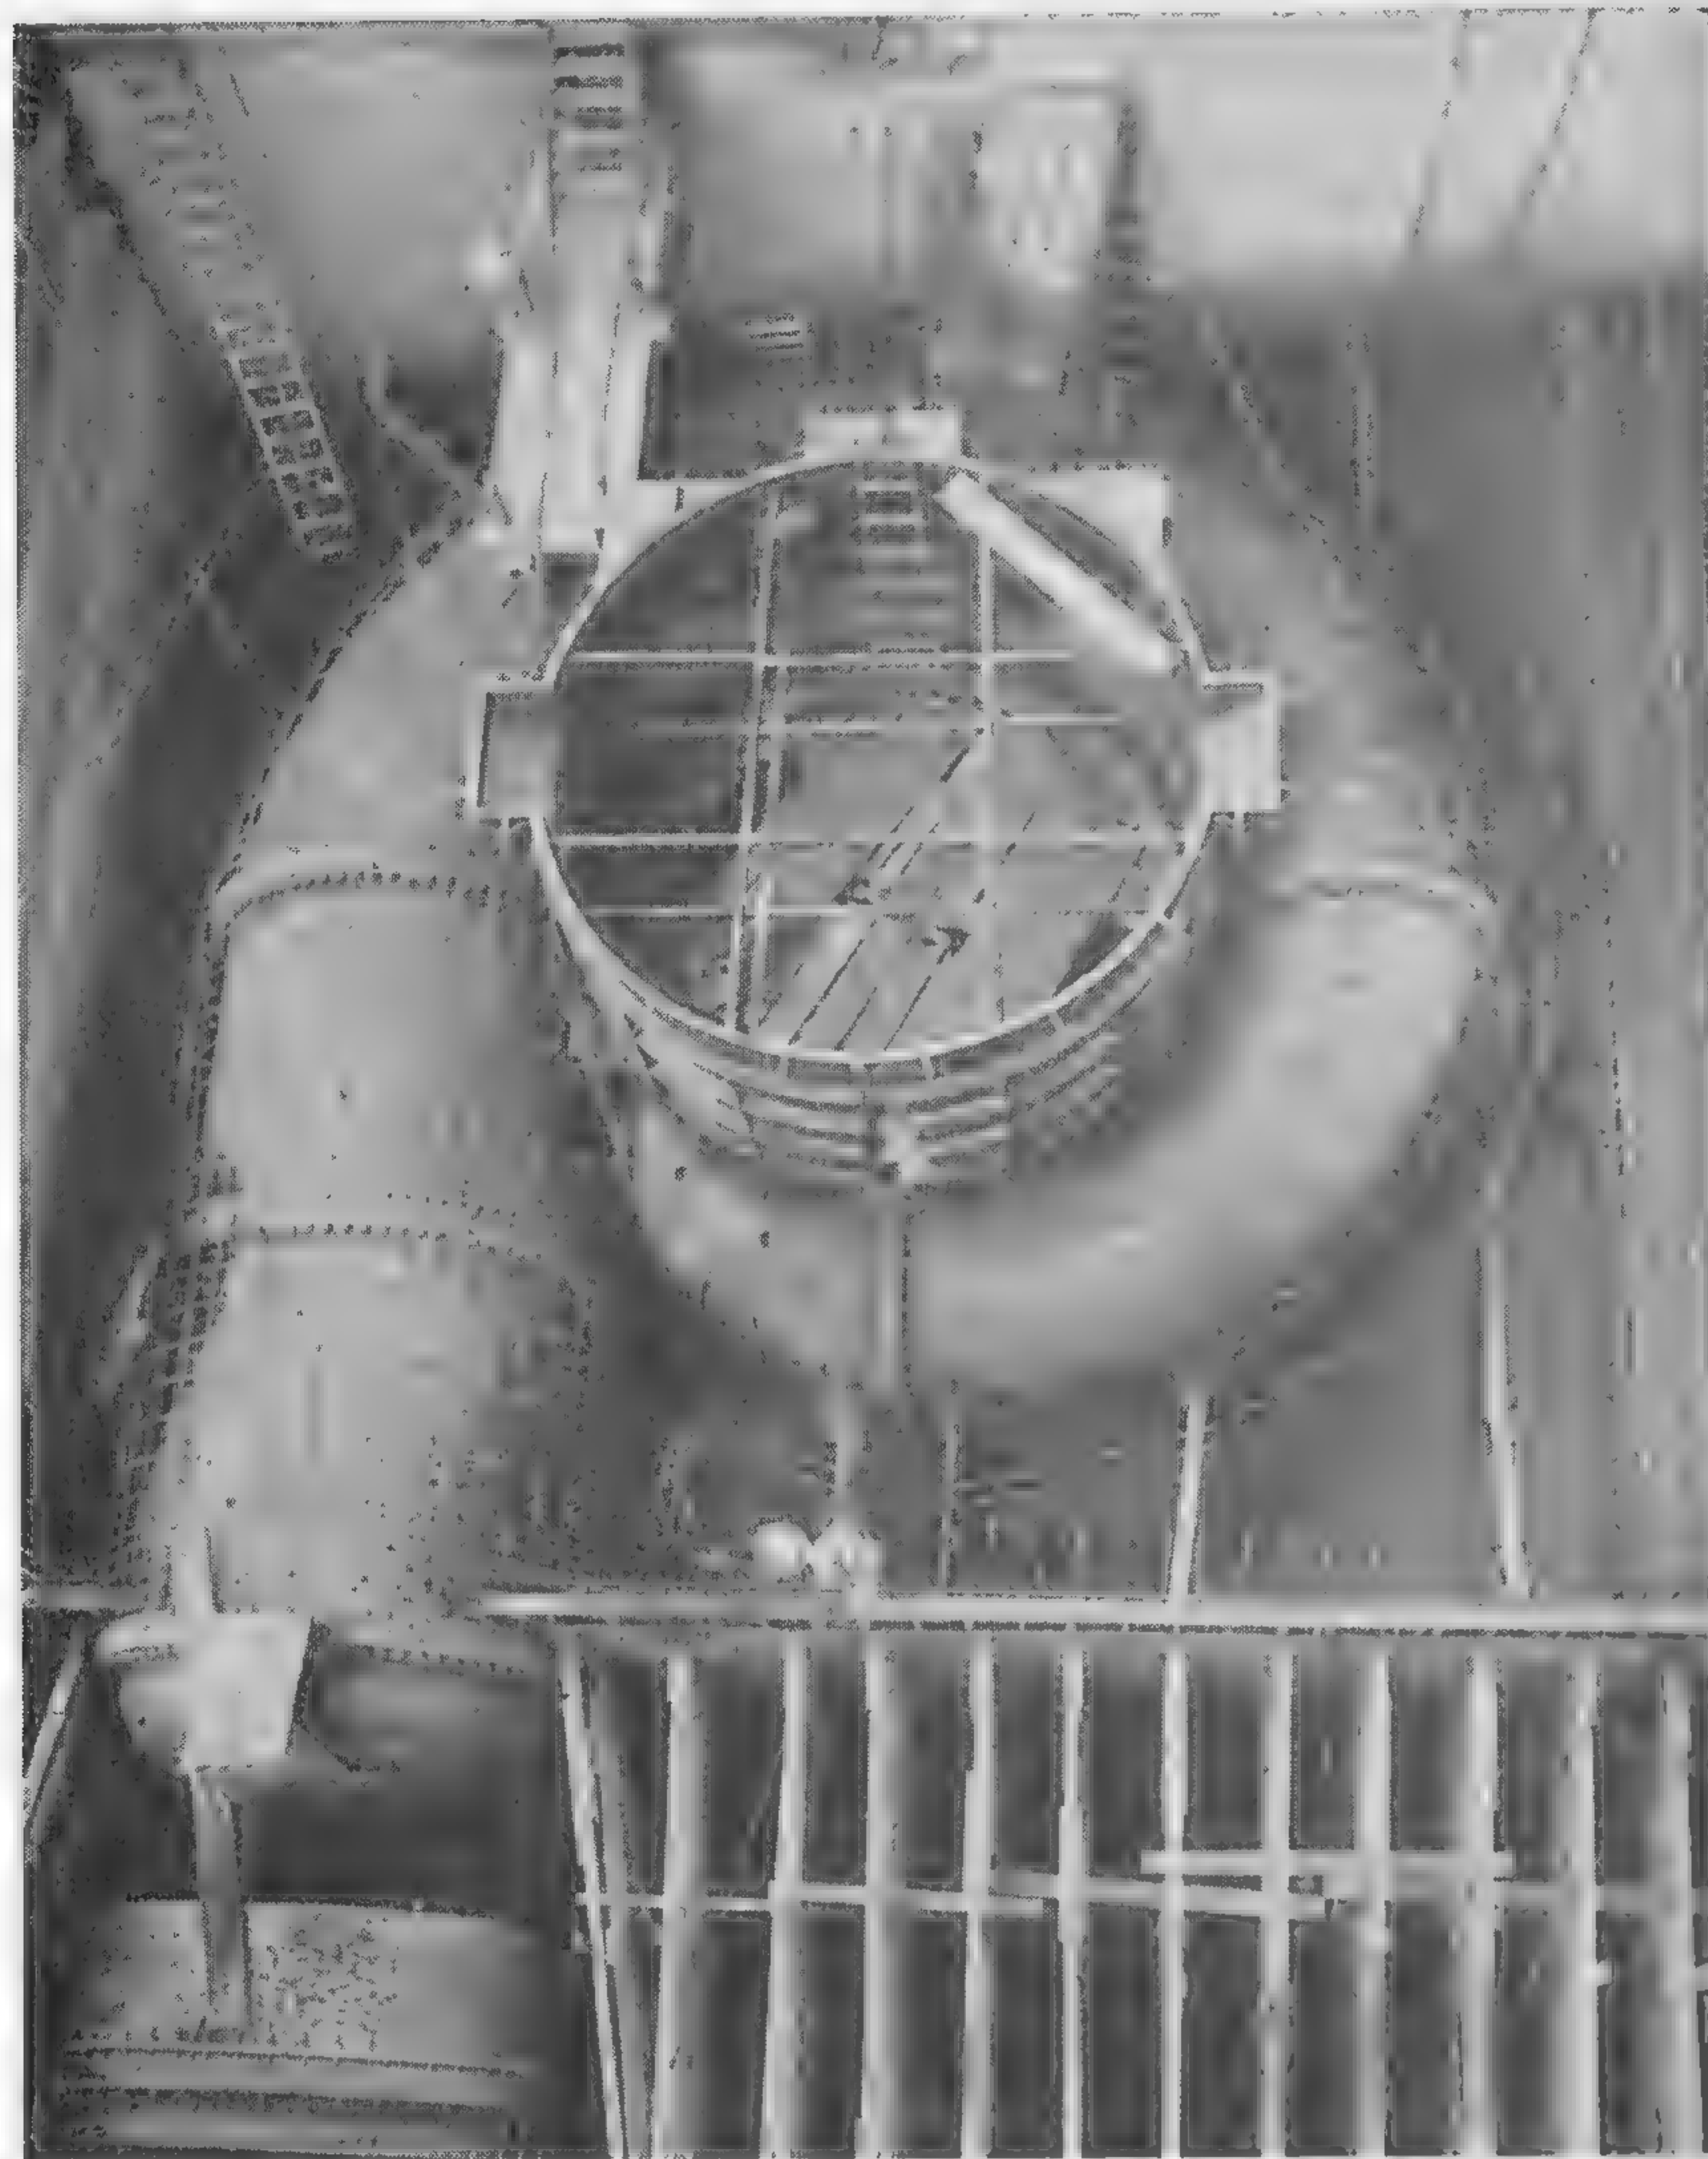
Welded steel scroll case at Hungry Horse Dam. Inlet diameter 11 ft; rated head 400 ft. (Bureau of Reclamation)
